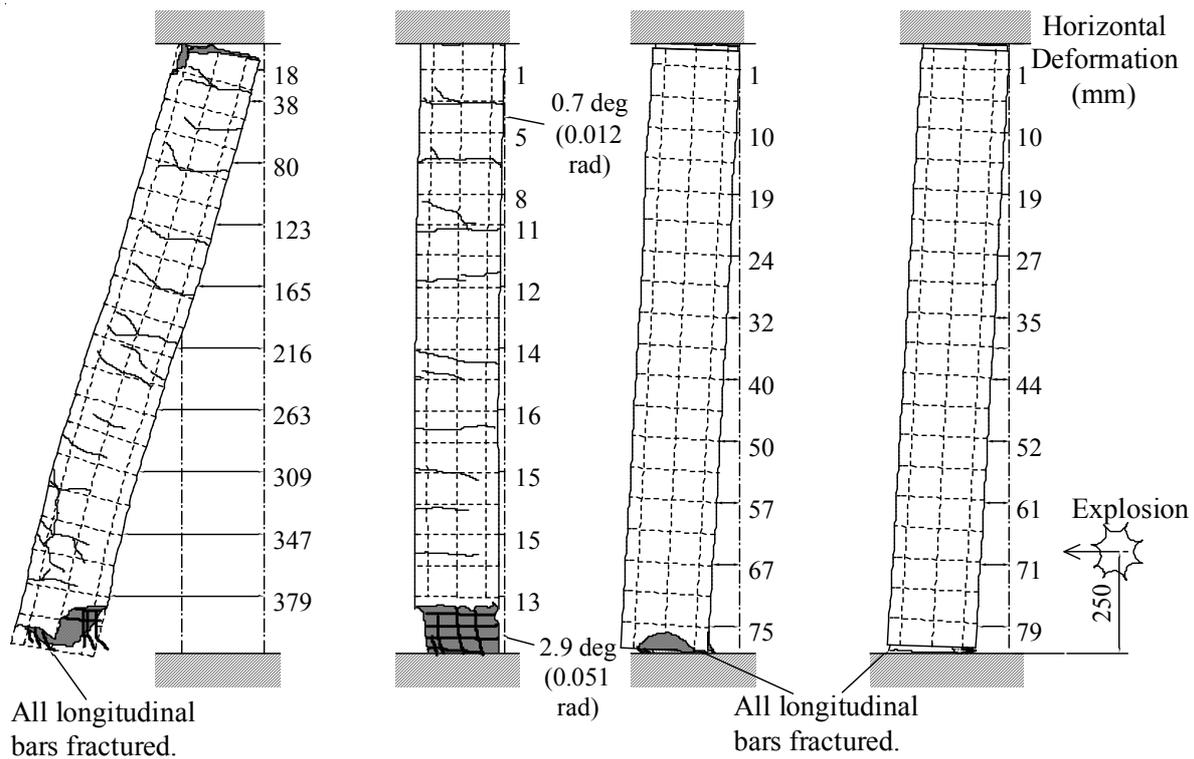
Sketches of columns after tests from side view: Left to right, (a) Column RC1, Test 1 (b) Column RC2, Test 2(c) Column SJ2, Test 3 (d) Column SJ1 Test 4
